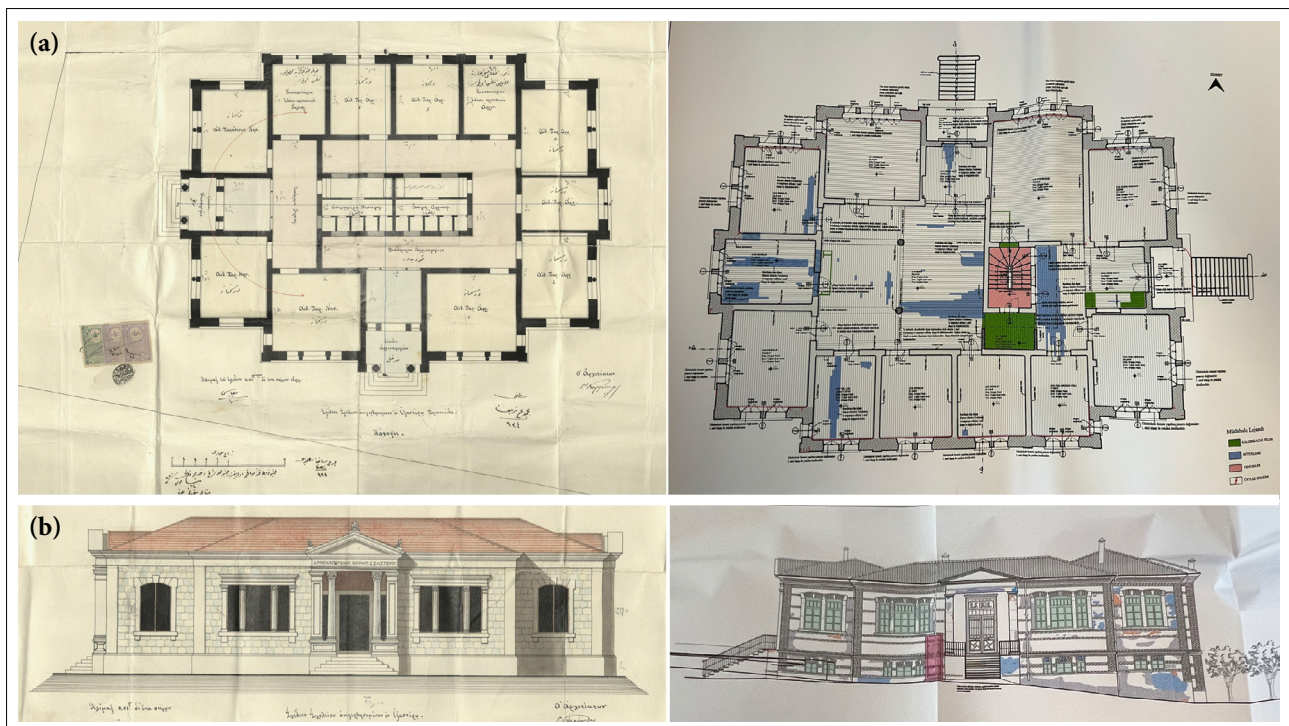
(a) Celaliye Greek School plan and front elevation archival drawing (BOA, I.AZN. 60/37); (b) Floor plan and elevation survey drawing, Anfora Architecture, 2009 (Conservation Council Archive).
